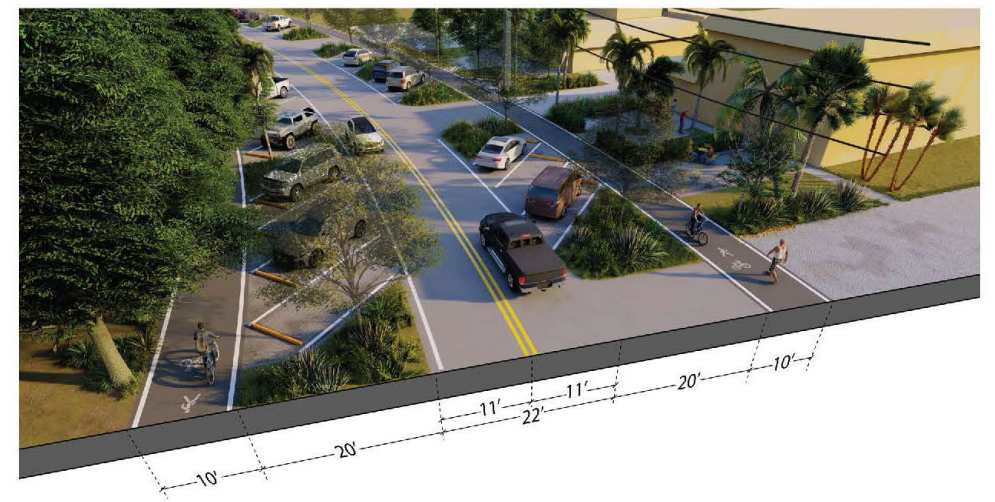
Add Angled On-Street Parking and Shade Trees with Landscaping. In this alternative, angled parking is added instead of parallel. This increases the amount of parking provided on-street, but does reduce some of the space for plantings. This option slightly increases the overall width of the street paving and impervious ground cover, and the shared use paths would need to be relocated closer to the edge of the right-of-way.
